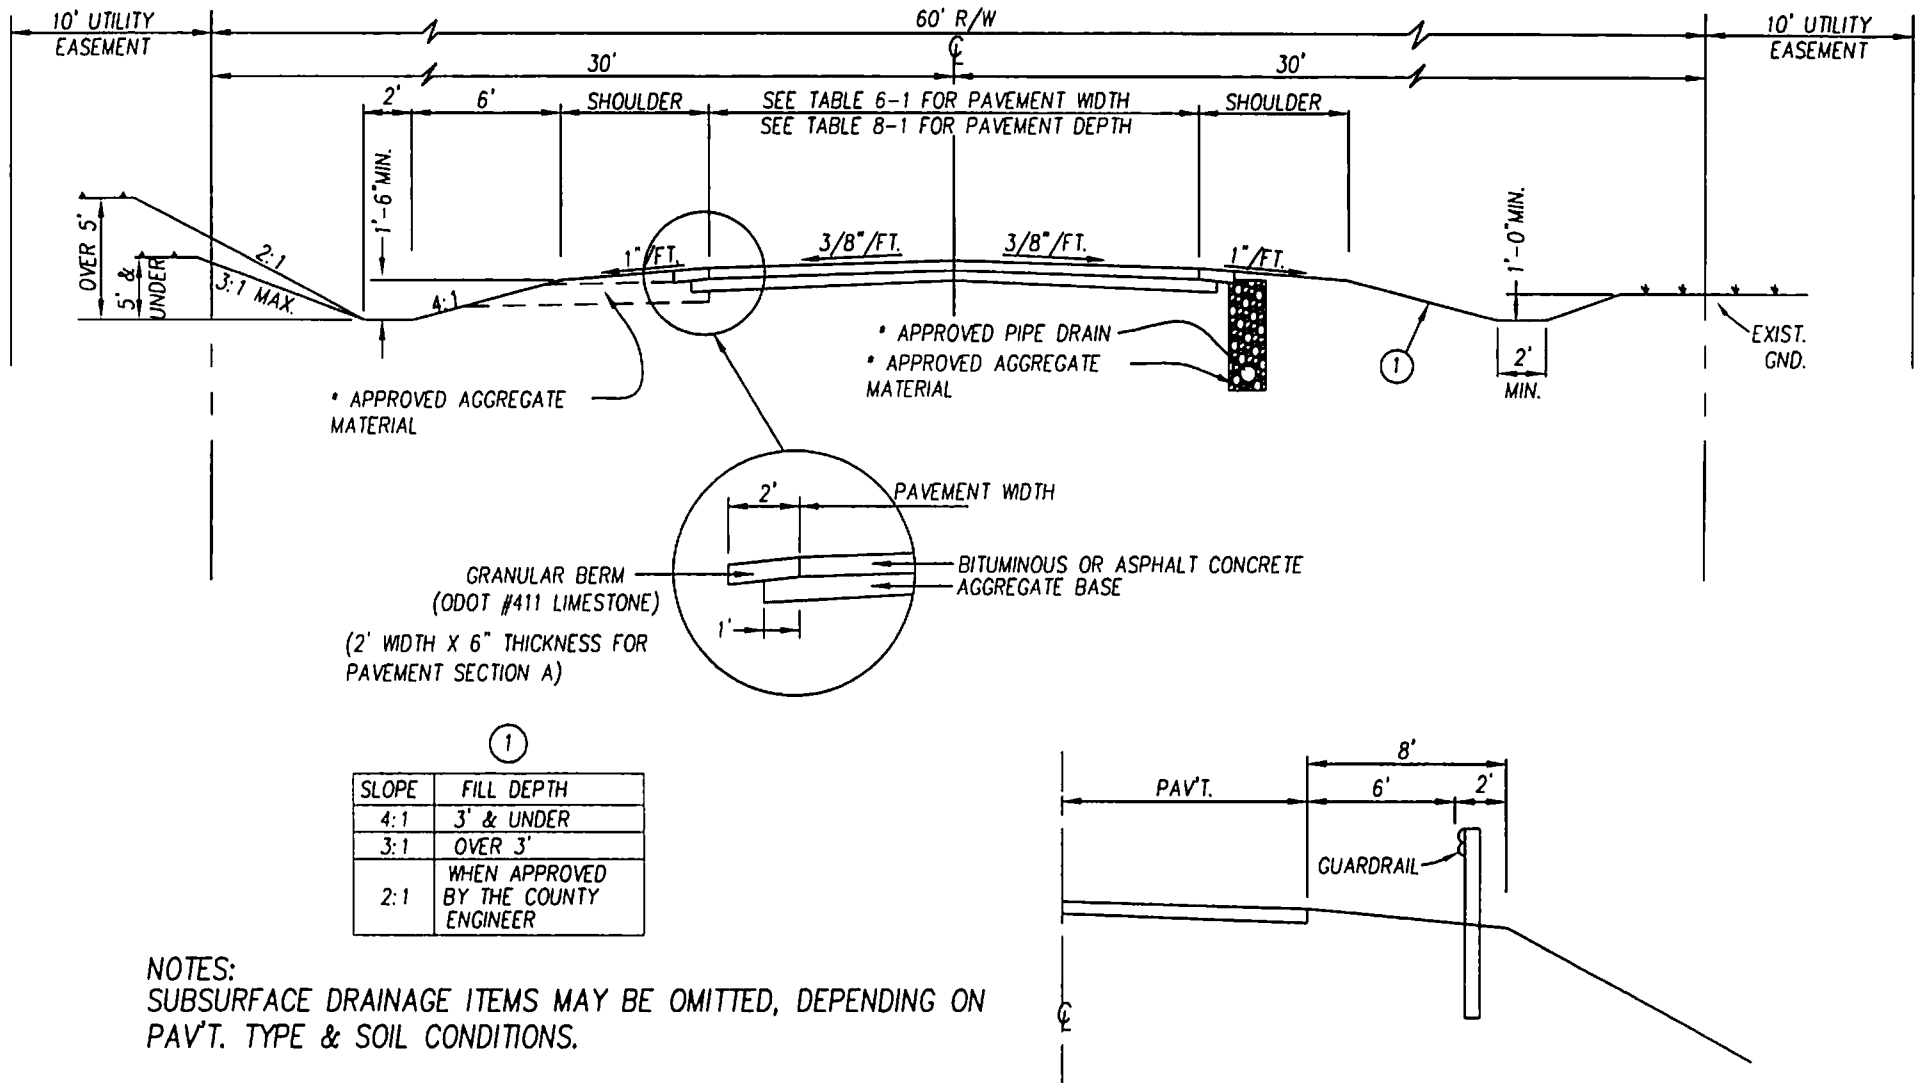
Typical Street Section III - Roadside Ditches
